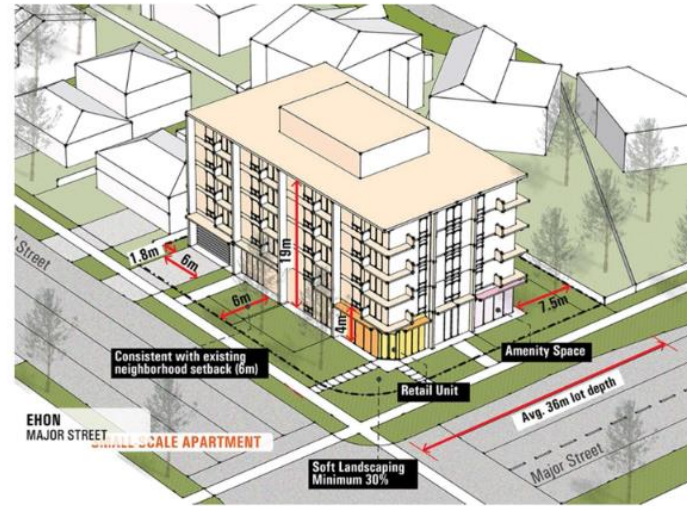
Potential Massing Models with Small-Scale Apartment on Rear Facing Lots on Major Streets
